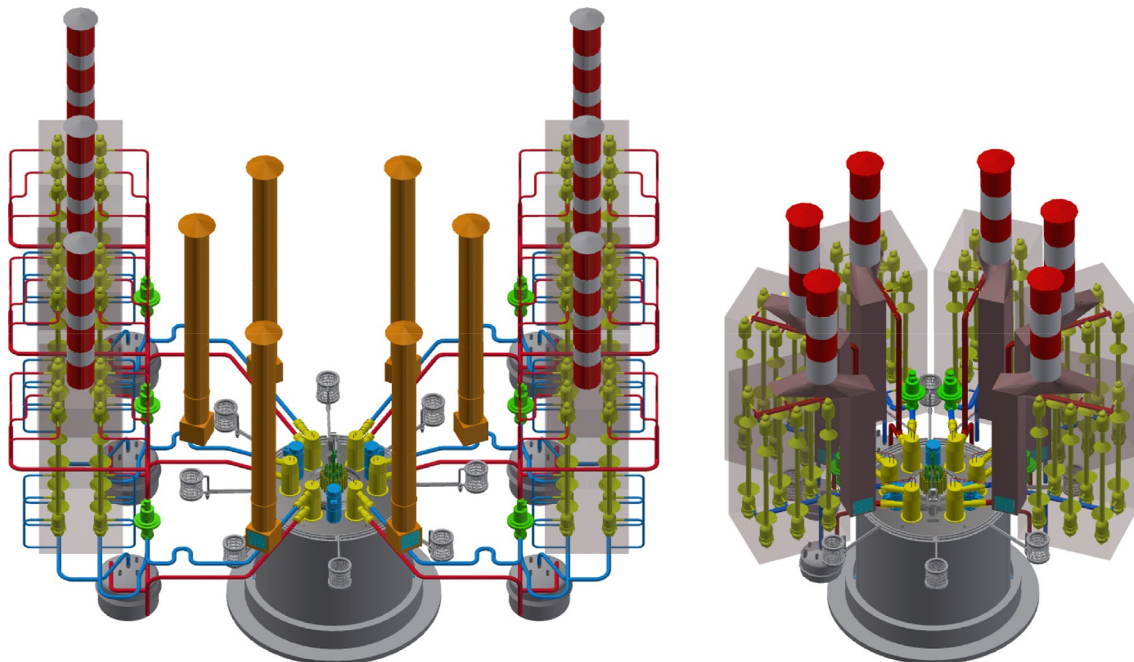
Original plant layout (left) vs new circular layout (right) in general view of plant
